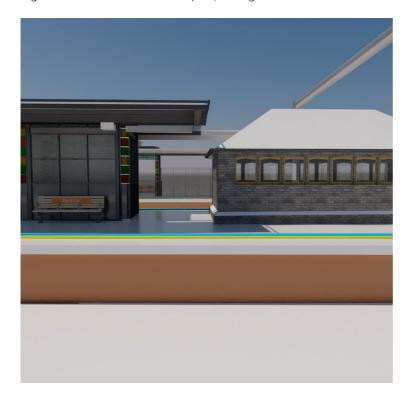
Lift 2 structure and canopy on Platform 2/3; facing west
